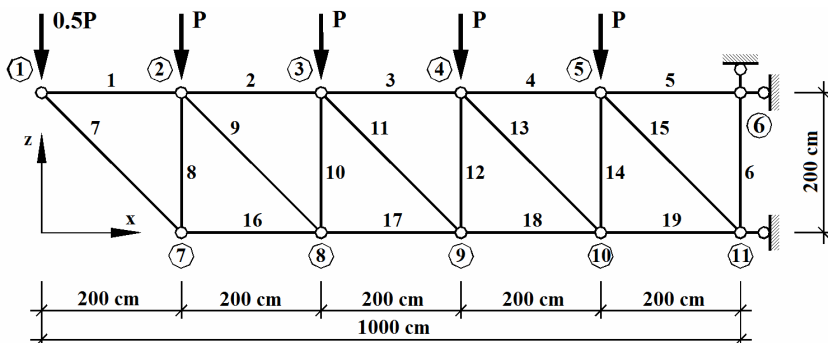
Design scheme of the 19-bar cantilever truss
